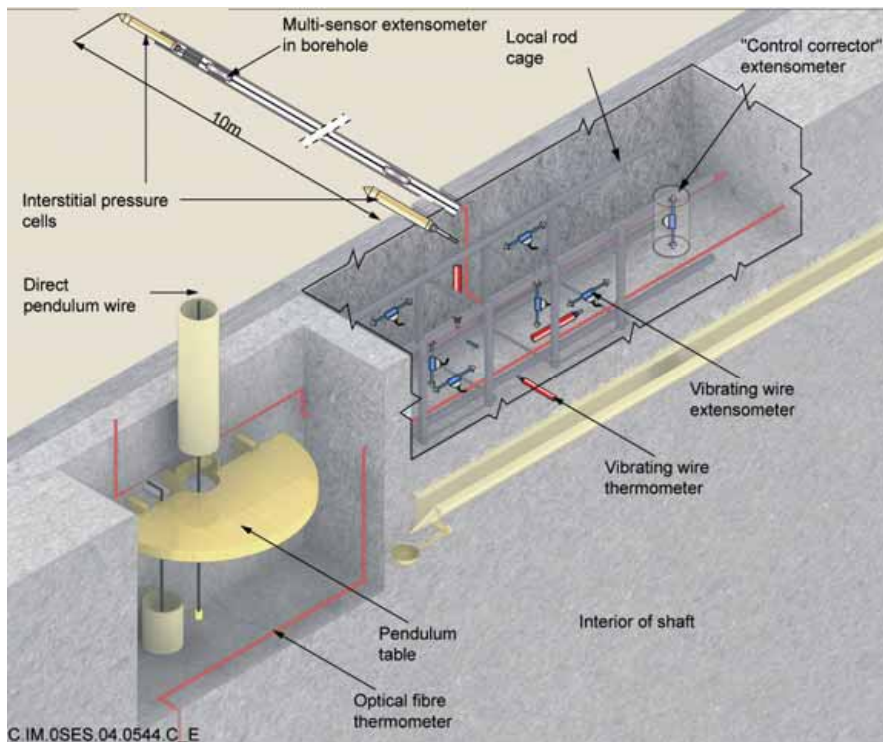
Equipment installed in a monitoring unit in a shaft wall
